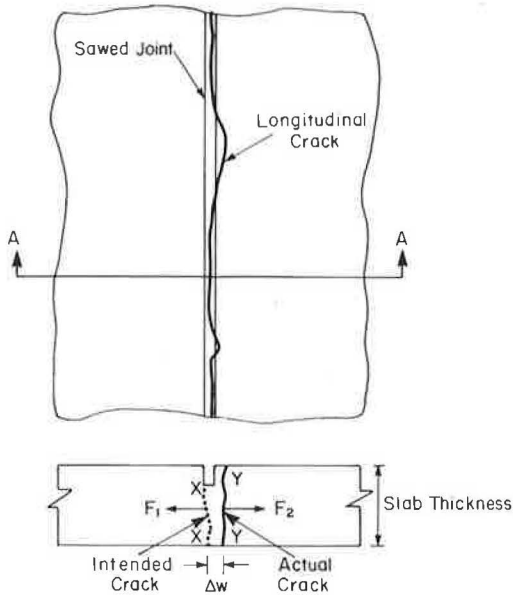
Concrete pavement with saw-cut joint and longitudinal crack.
